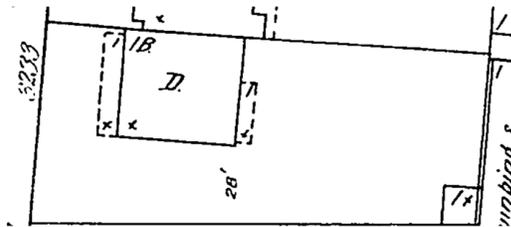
Site plans of 3233 Ellis Street in 1911 (left). North is up.
